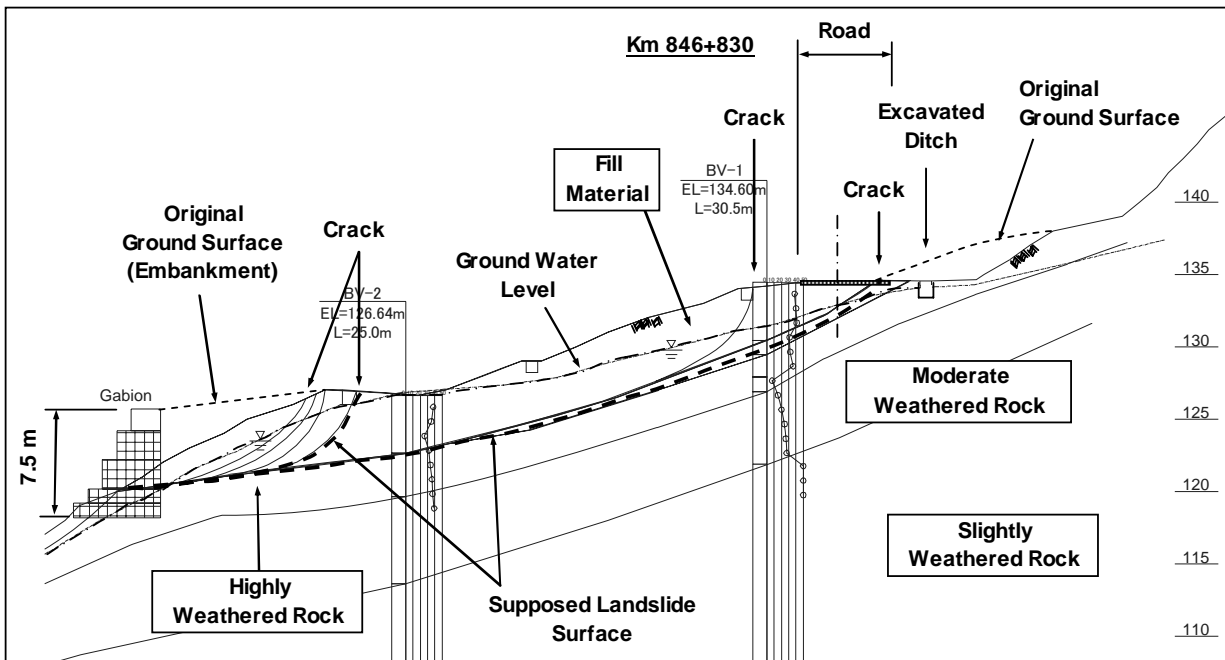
Engineering Geological Profiling at Wright-Taft Road (Km 846)
